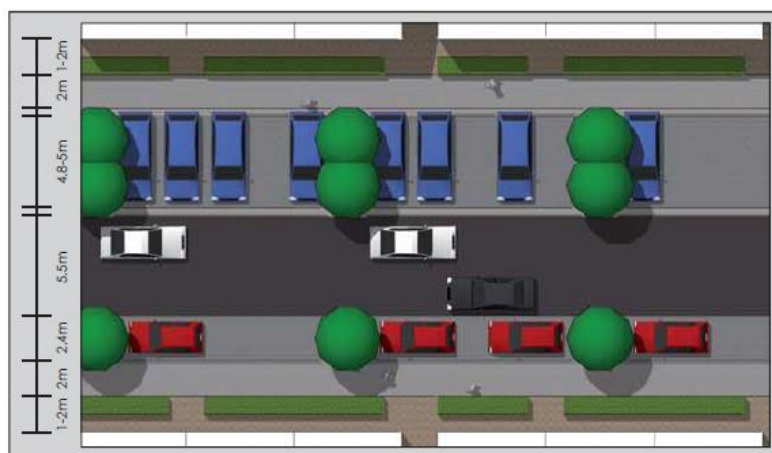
Extract from the Newcastle LAP (South Dublin County Council) illustrating the layout of a local street with a uniform mix of parallel and perpendicular parking.
